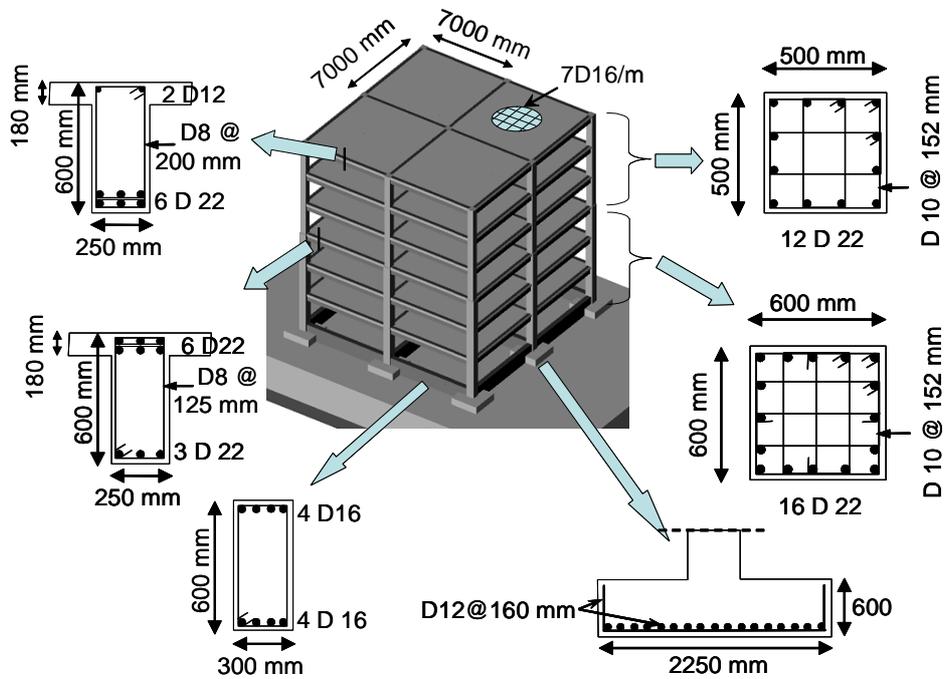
Details of the multi-storey framed reinforced concrete structure
